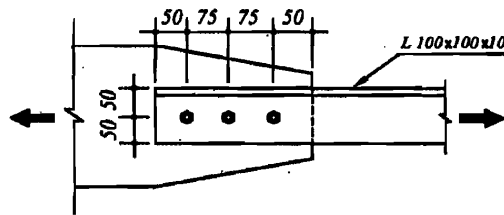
Misc. Connection: Truss Column C2 / Truss B7
